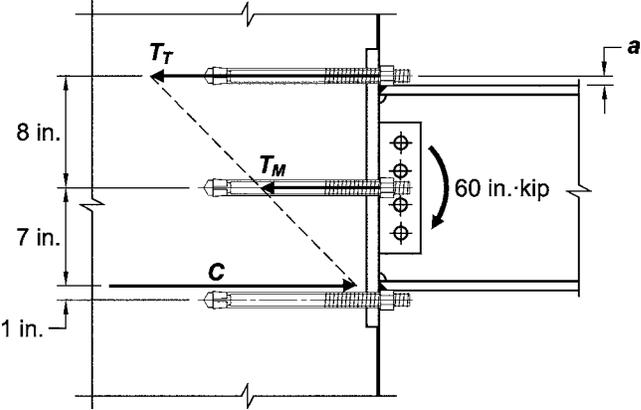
Example 11: Beam support consisting of plate fastened with post-installed undercut anchors.
